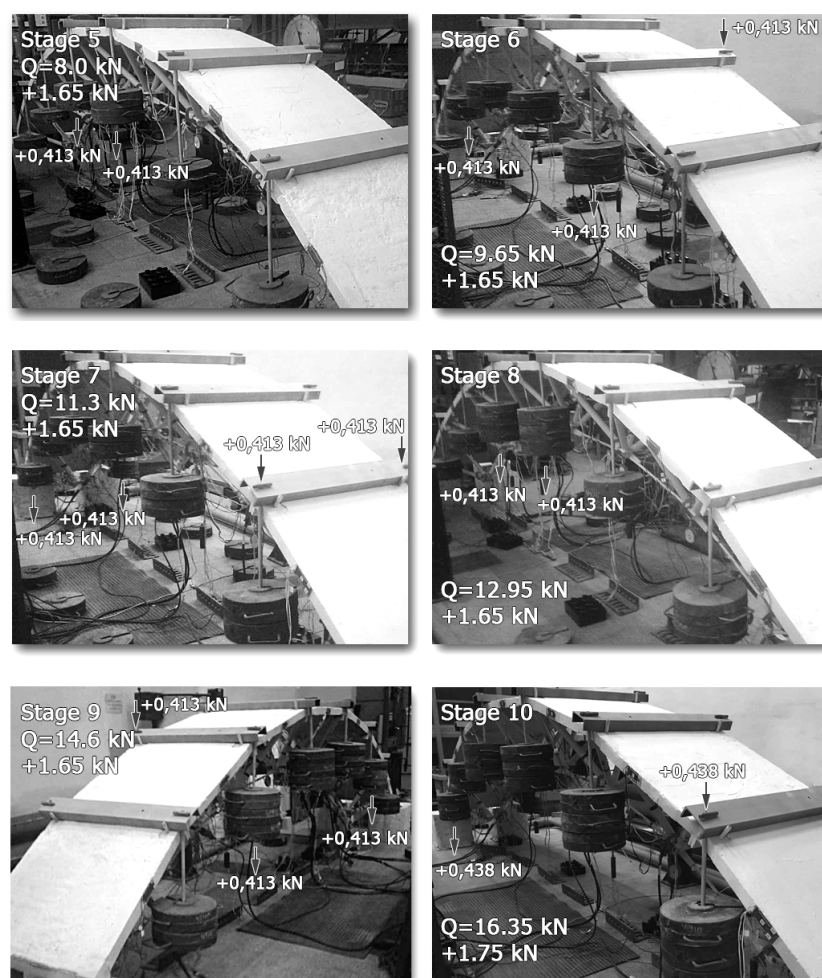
The full-scale experimental sample of the steel and concrete composite cable space frame during the test
